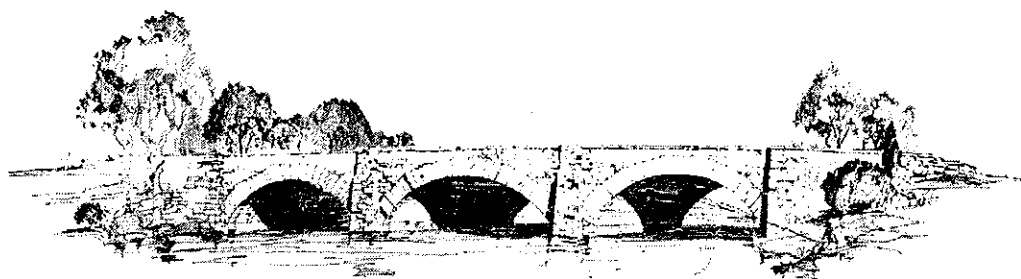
Architectural elevation of bridge over Hunting Creek
